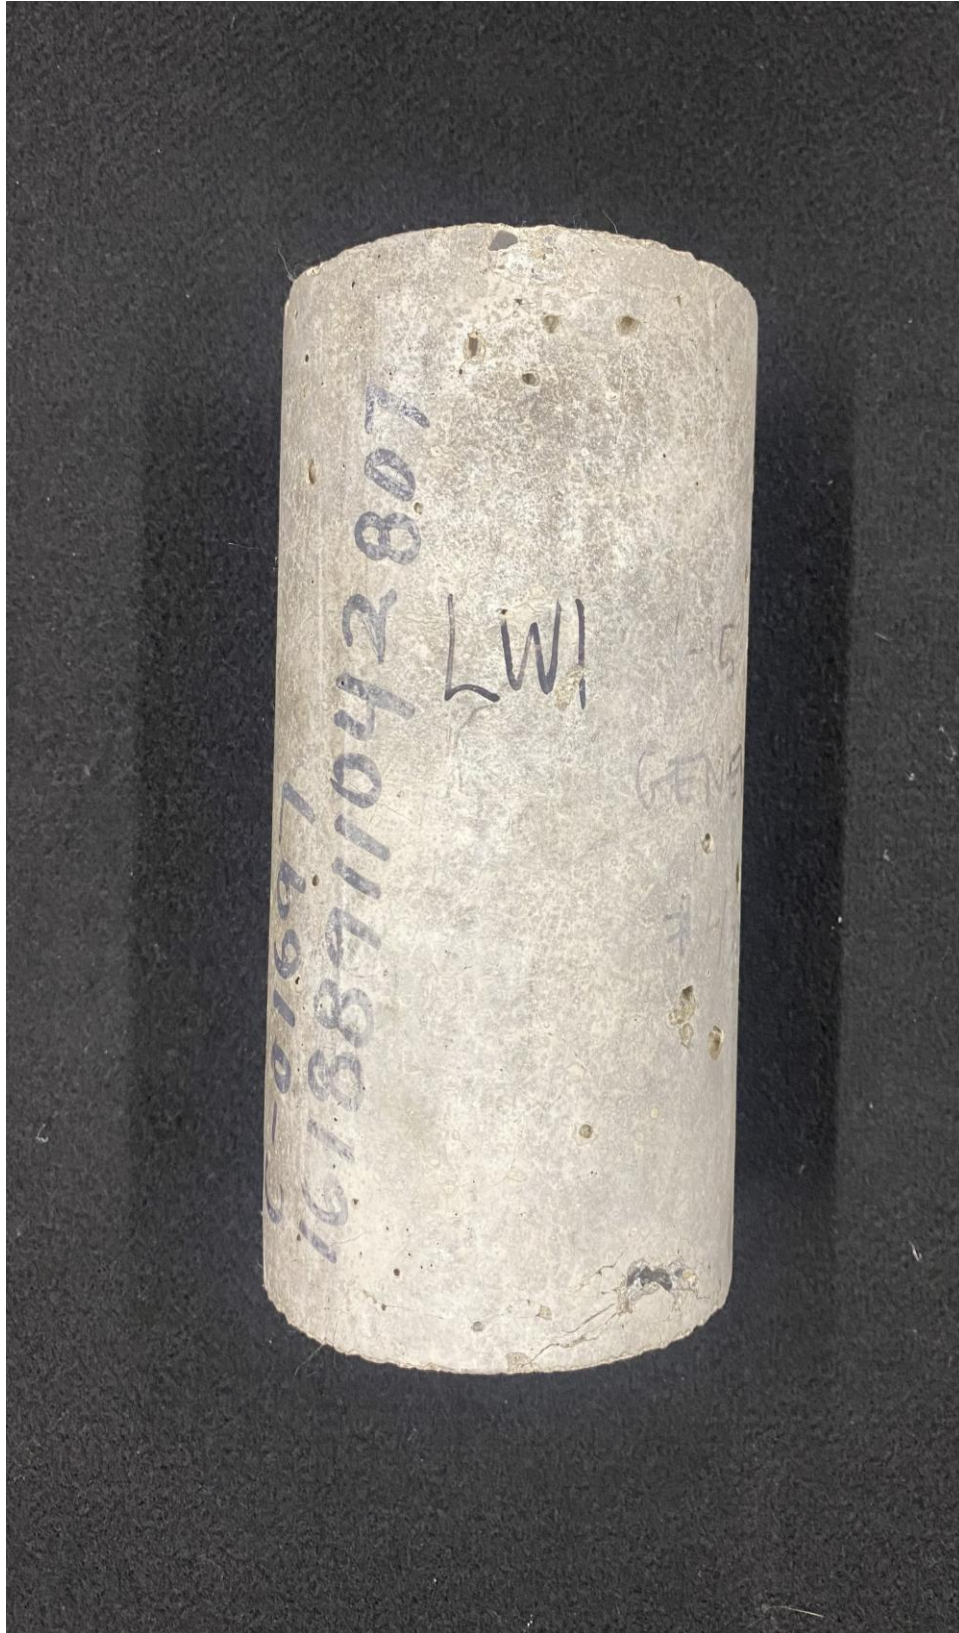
Cylinder 1 of lightweight concrete deck at bridge C-993 (after testing).
